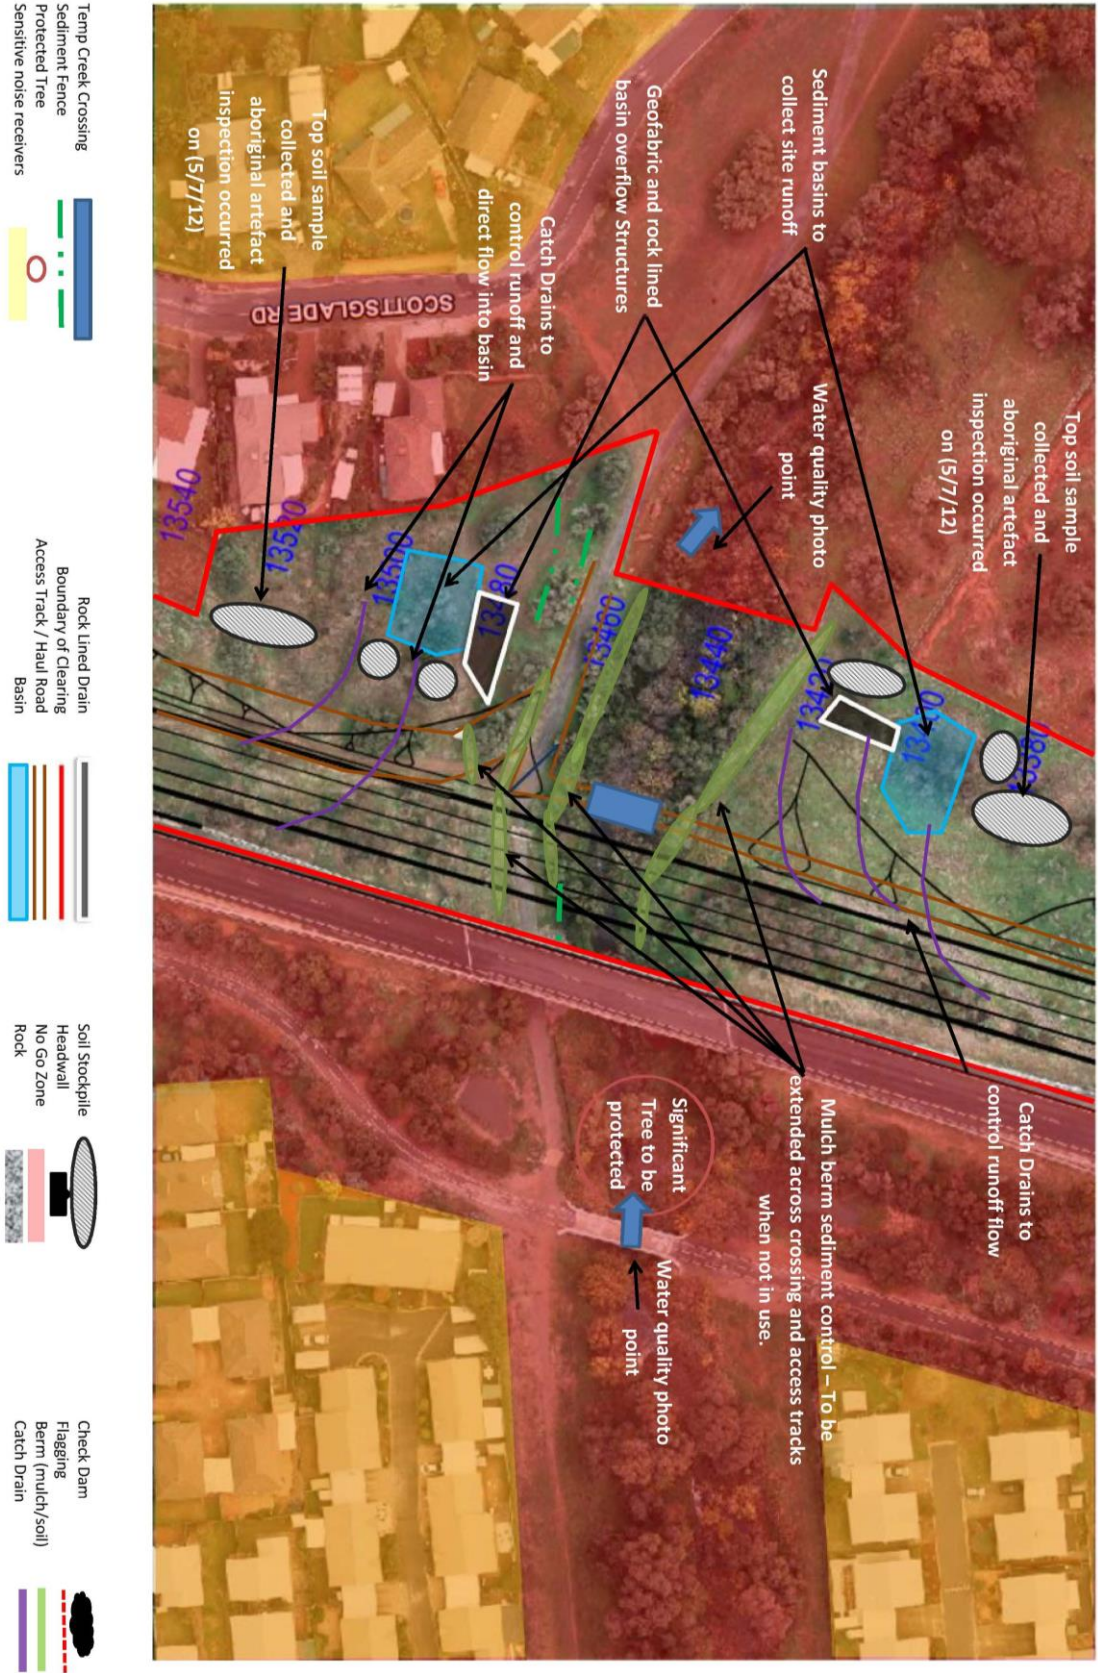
An example of a Contractor Soil Erosion & Drainage Management Plan Site Plan
